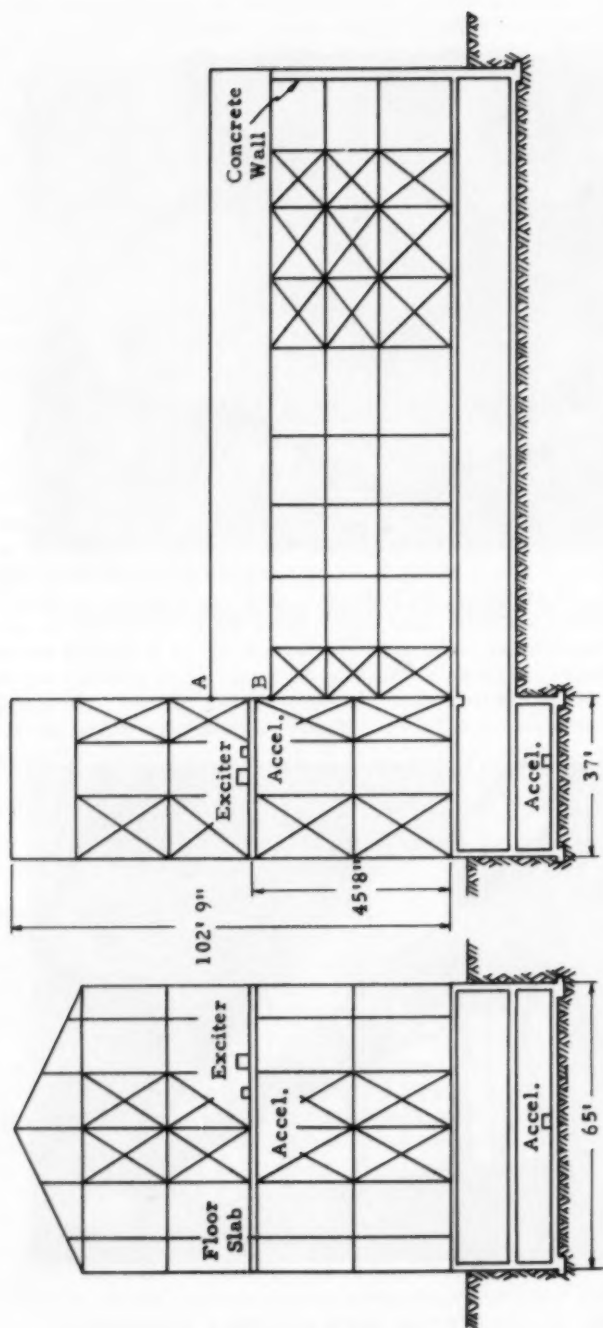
SCHEMATIC DRAWING OF TEST BUILDING
